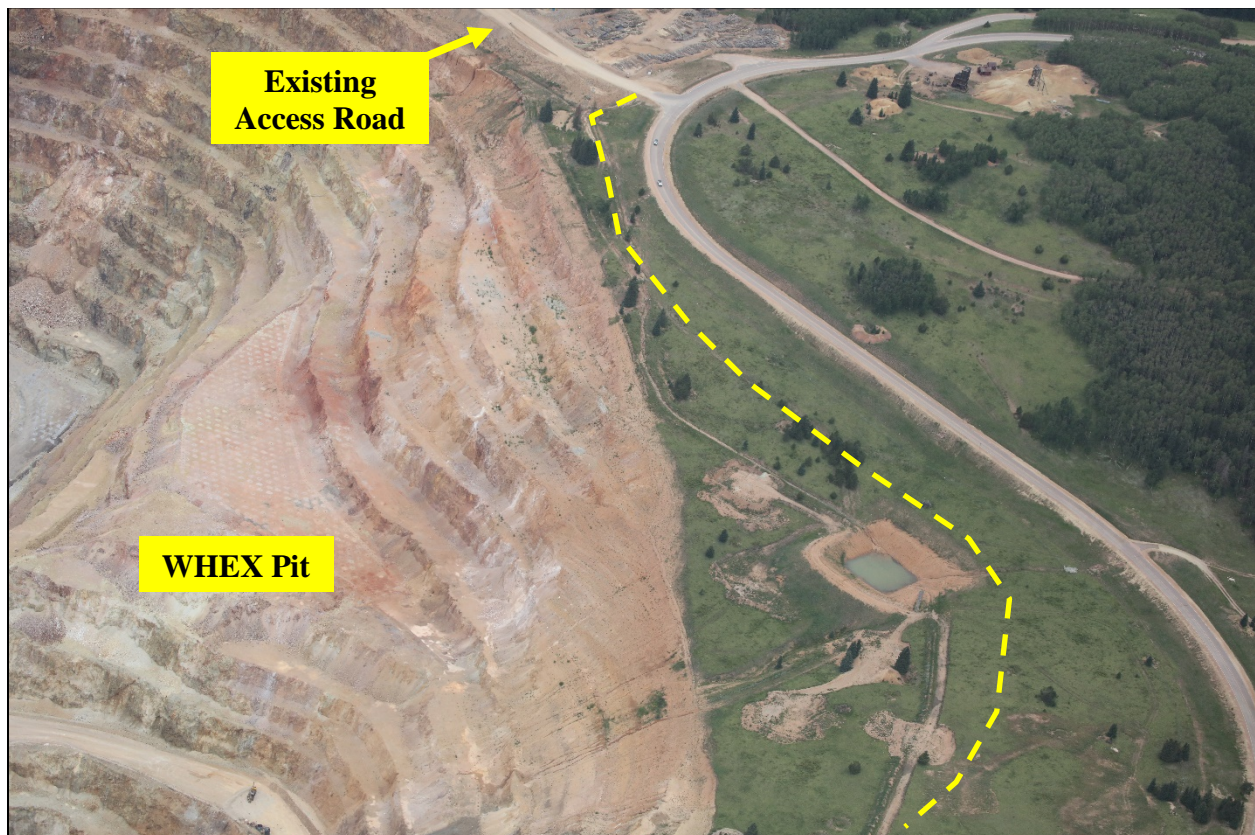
Area of proposed Ironclad Access Road relocation; looking west.
